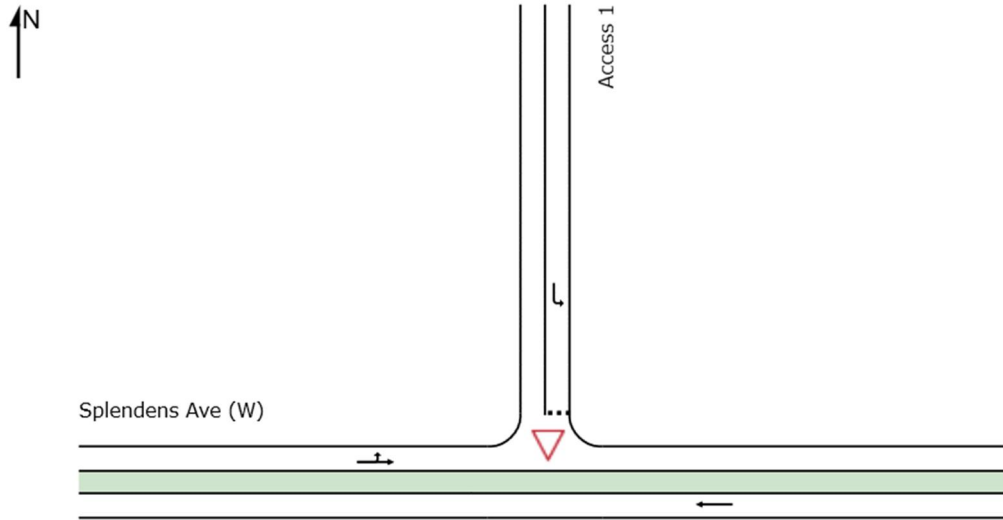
SIDRA Layout for Splendens Avenue / Access 1 (Proposed Future Layout)
